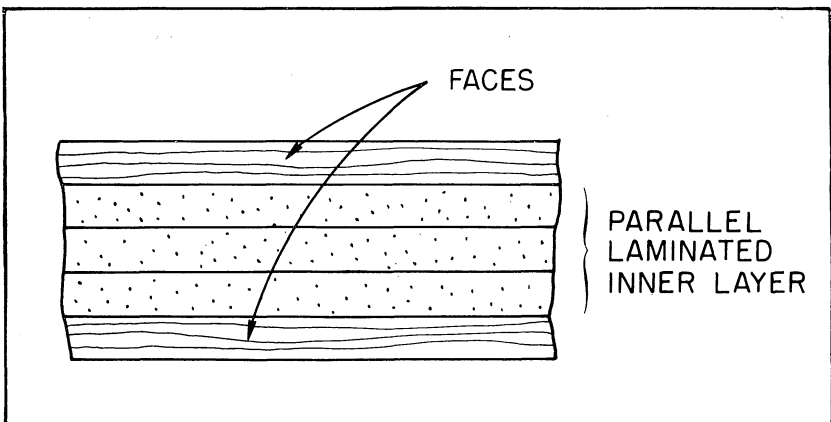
5-ply plywood constructed with parallel laminated inner layer.
